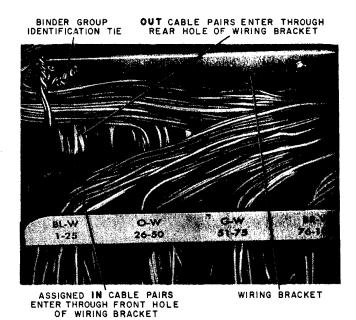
Assigned *IN* Cable Pair Routed Through Front Holes of Wiring Bracket
